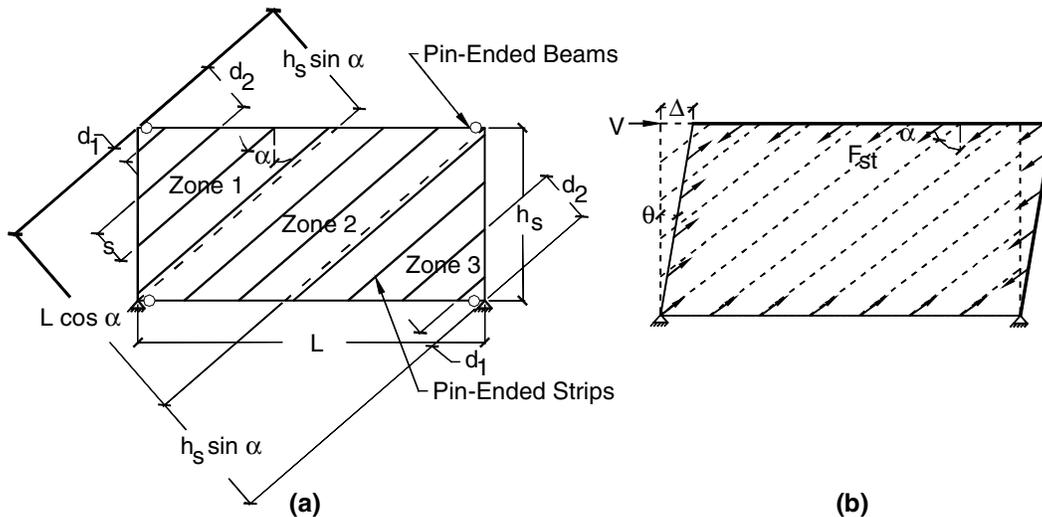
(a) Single Story Strip Model (b) Single Story Collapse Mechanism
